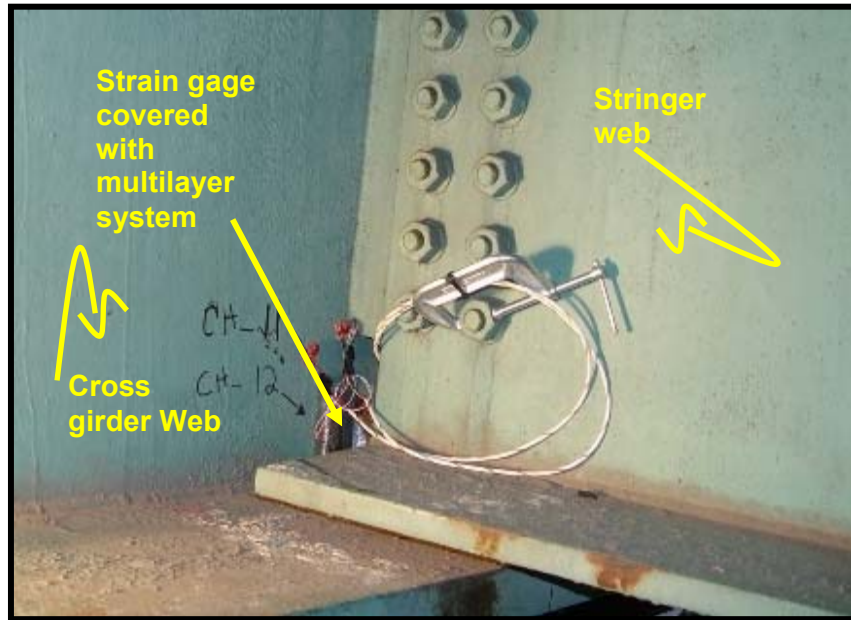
Strain gages CH_11 and CH_12 installed on the north face of the cross girder web at the 6 inches web gap of the transverse connection plate detail at interior stringer S3
